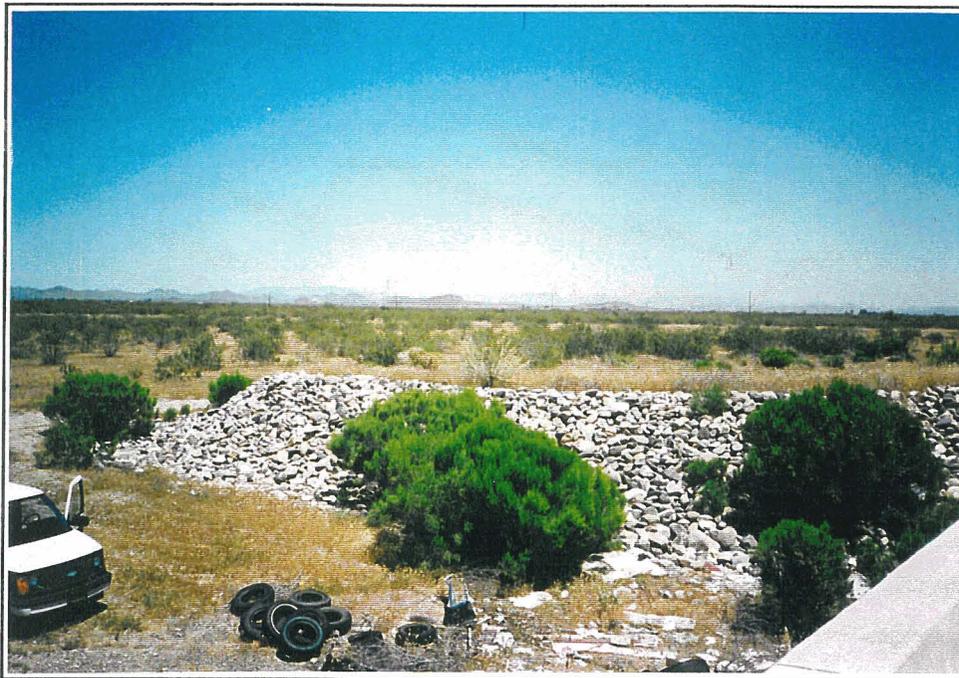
View looking approximately northeast in upstream direction from bridge deck. Note spur dike and trash dumped in foreground. In background note upstream left overbank with levee formed by roadway embankment and vegetation similar to that observed in Photo 1.
